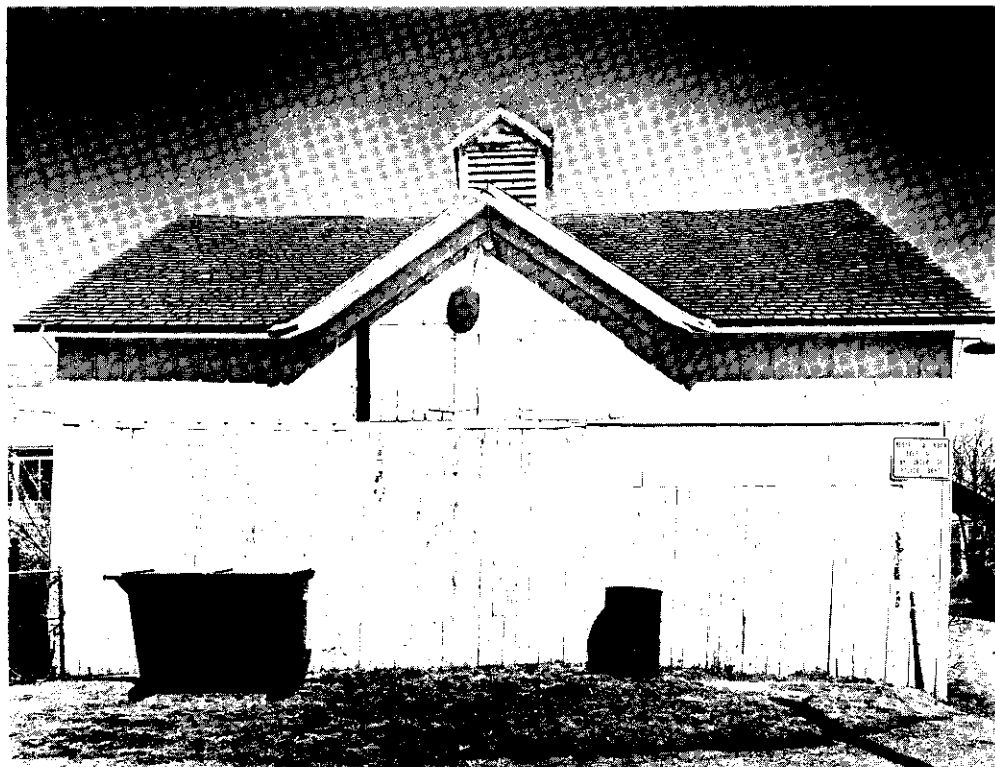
Truman Carriage House, Fall 1985. South elevation (looking north). Credit: Zoom Studios
